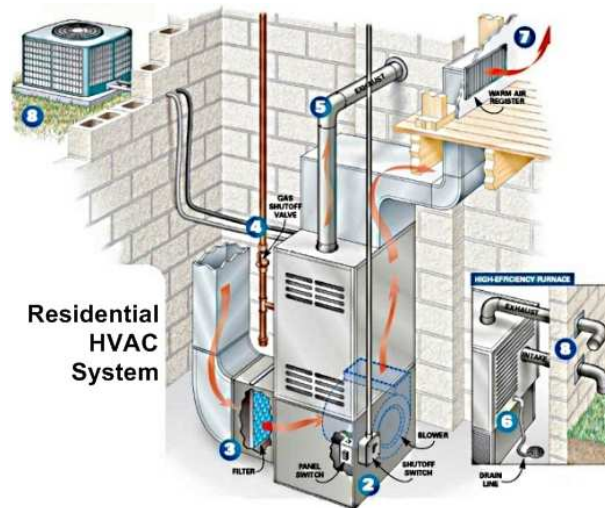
A cross-section view of a typical residence building HVAC system room.
